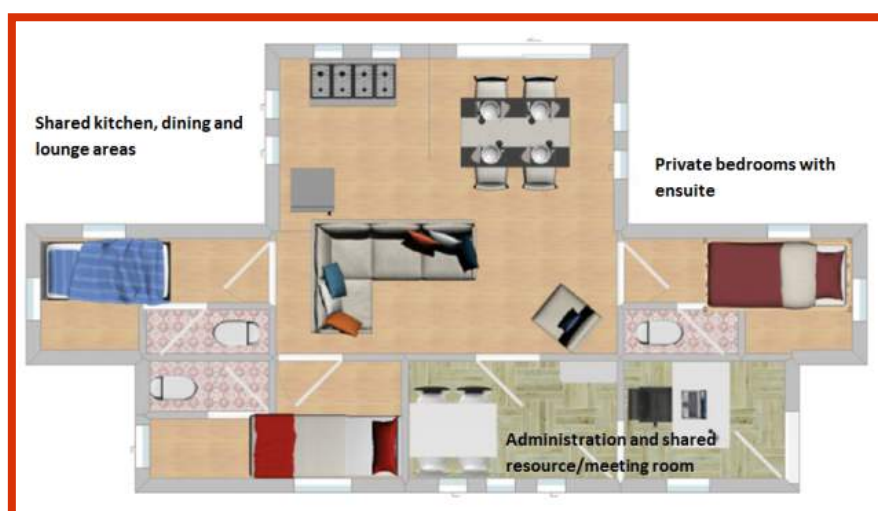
Plan of a communal refuge. Separate bedrooms with ensuites or shared bathrooms and shared kitchen and lounge facilities. Admin and resource room attached.
